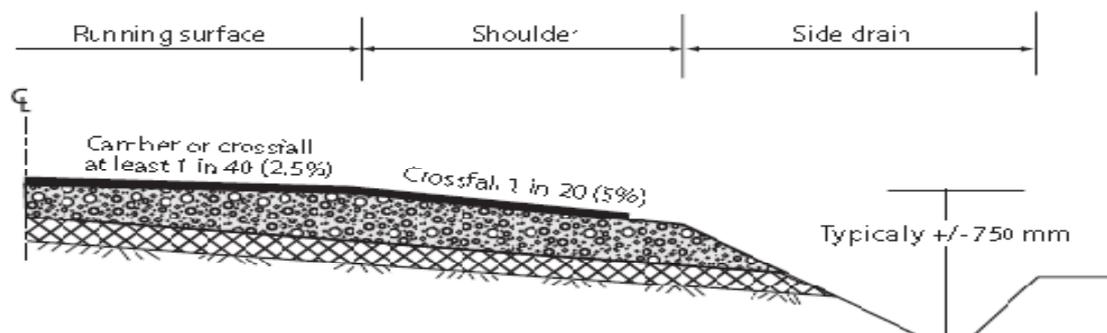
Ideal shoulder construction/drainage arrangements.
